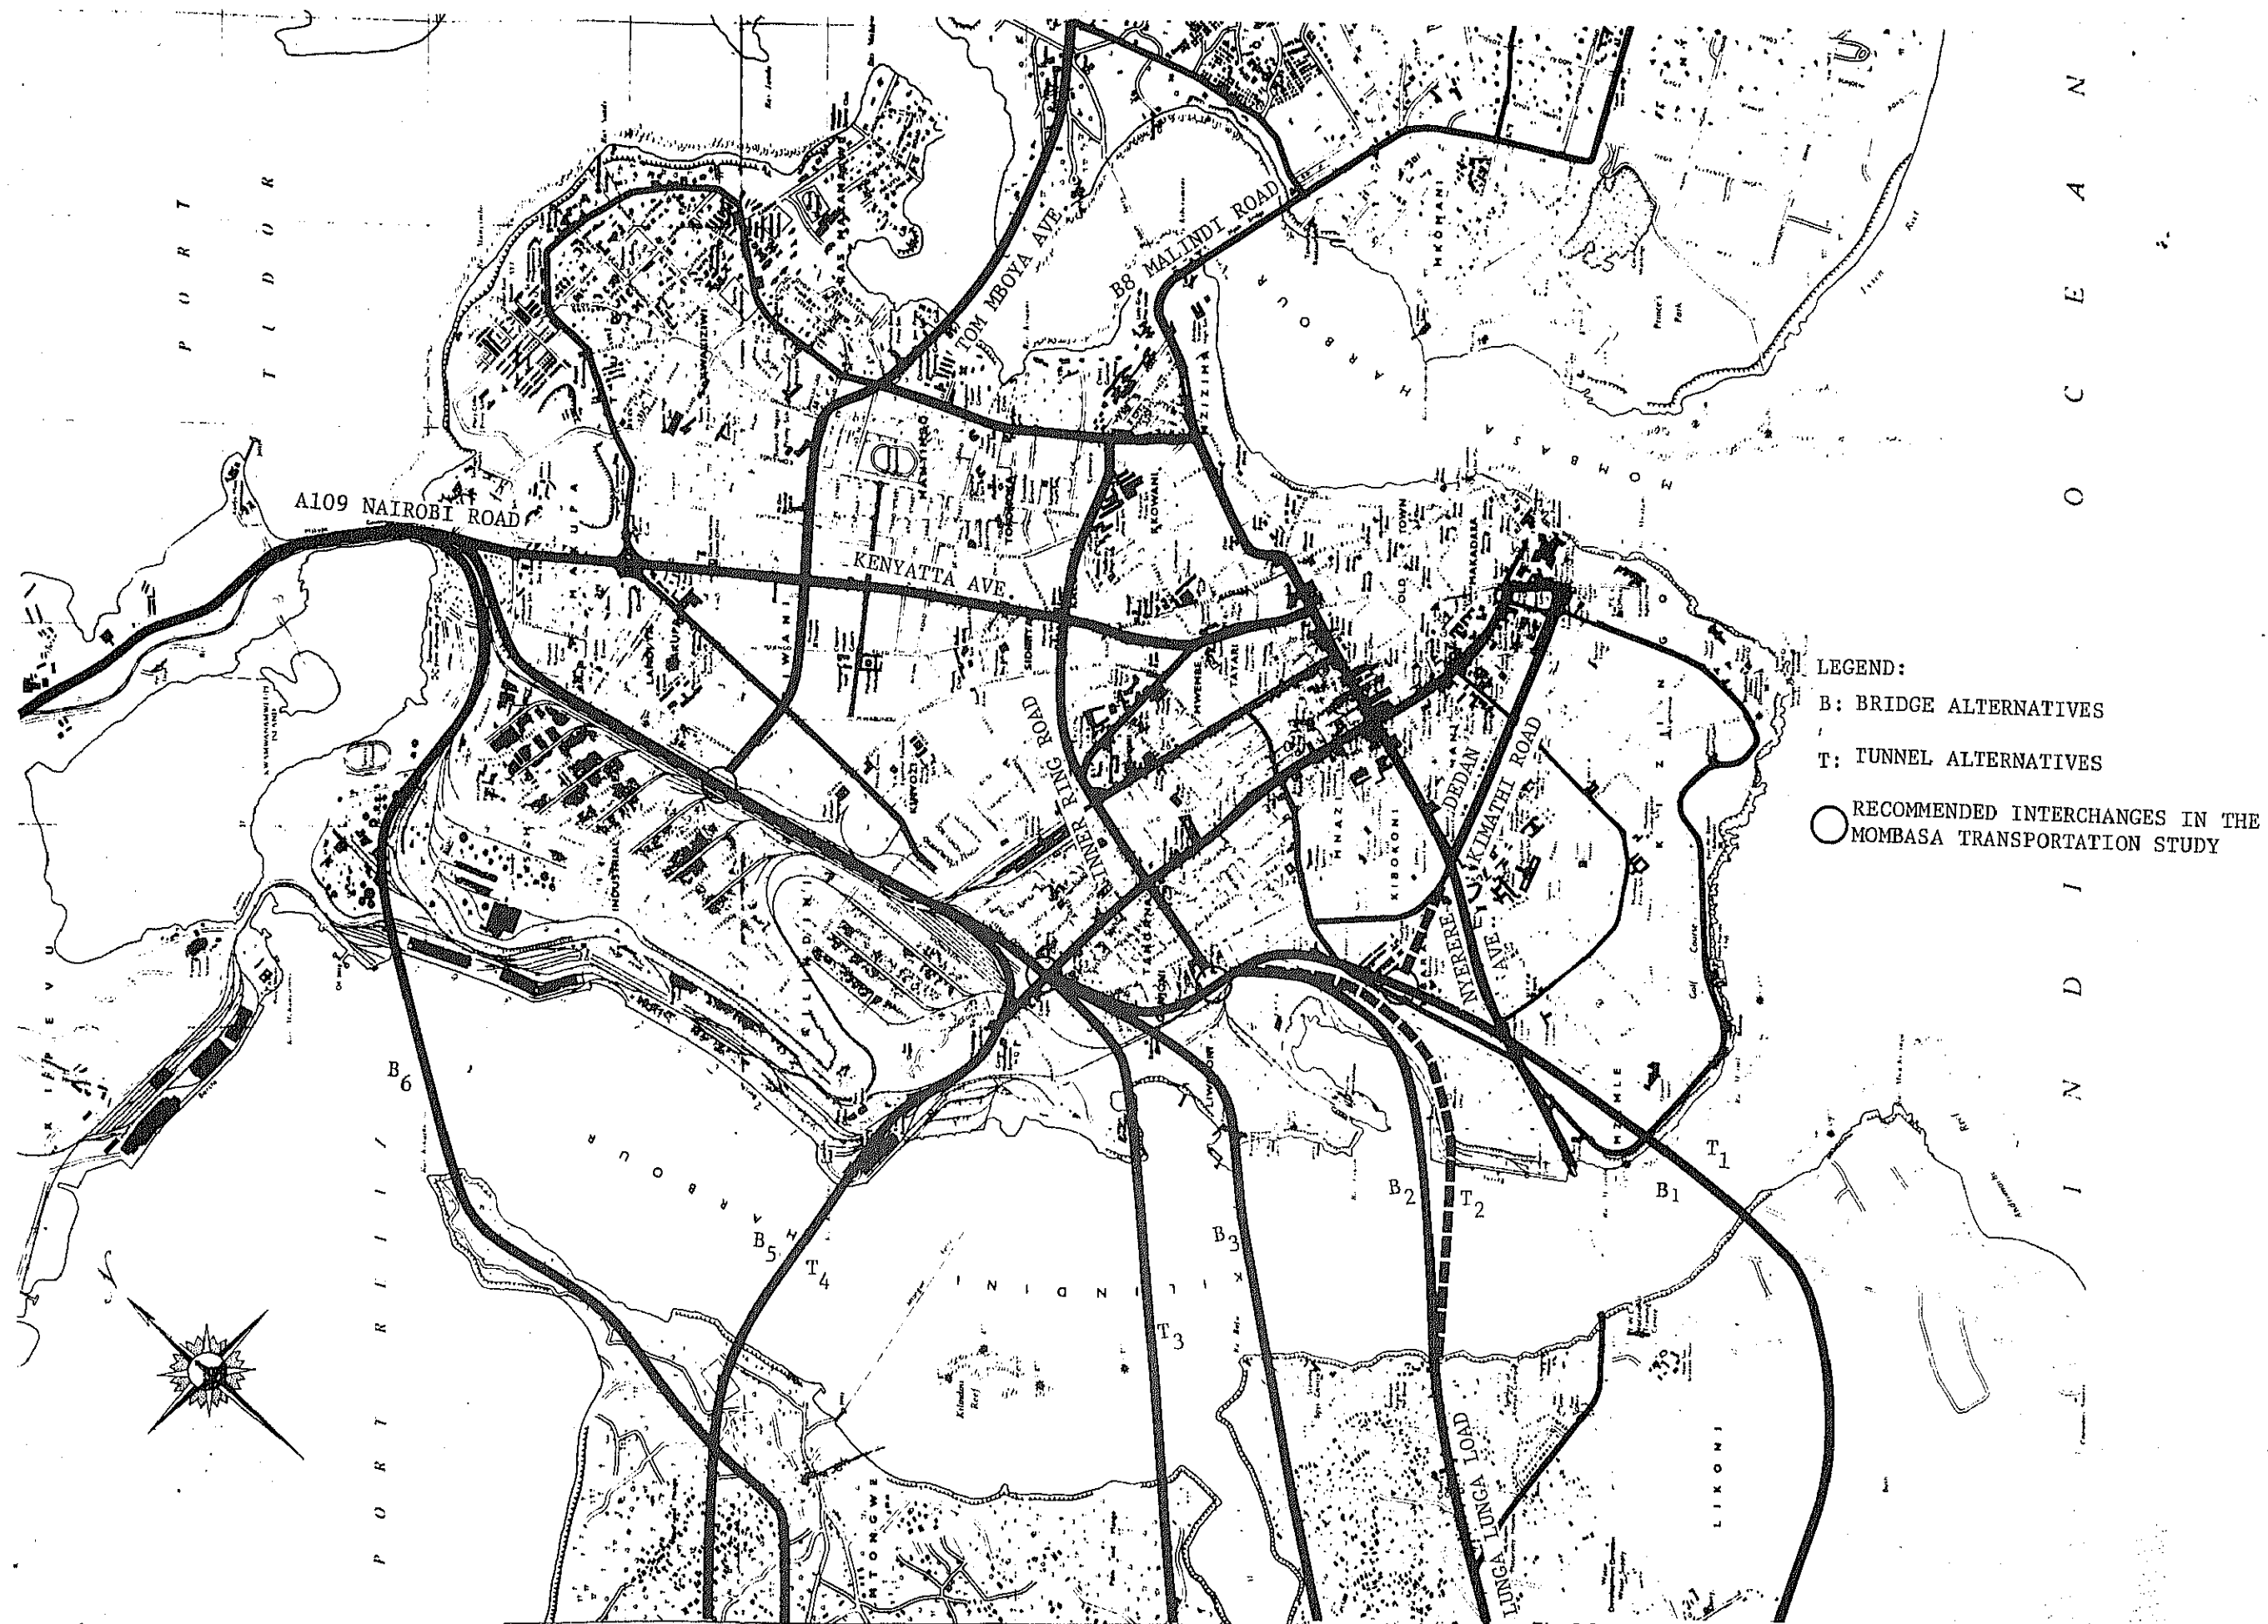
ALTERNATIVE CROSSING PLAN
